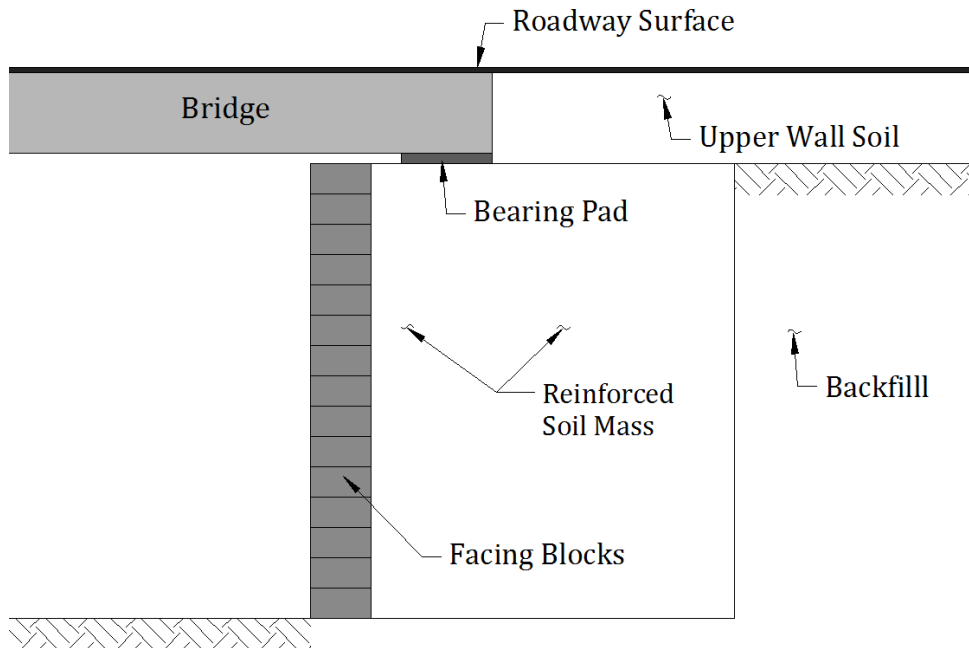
Abutment Wall Schematic for Bridge Loading Condition
